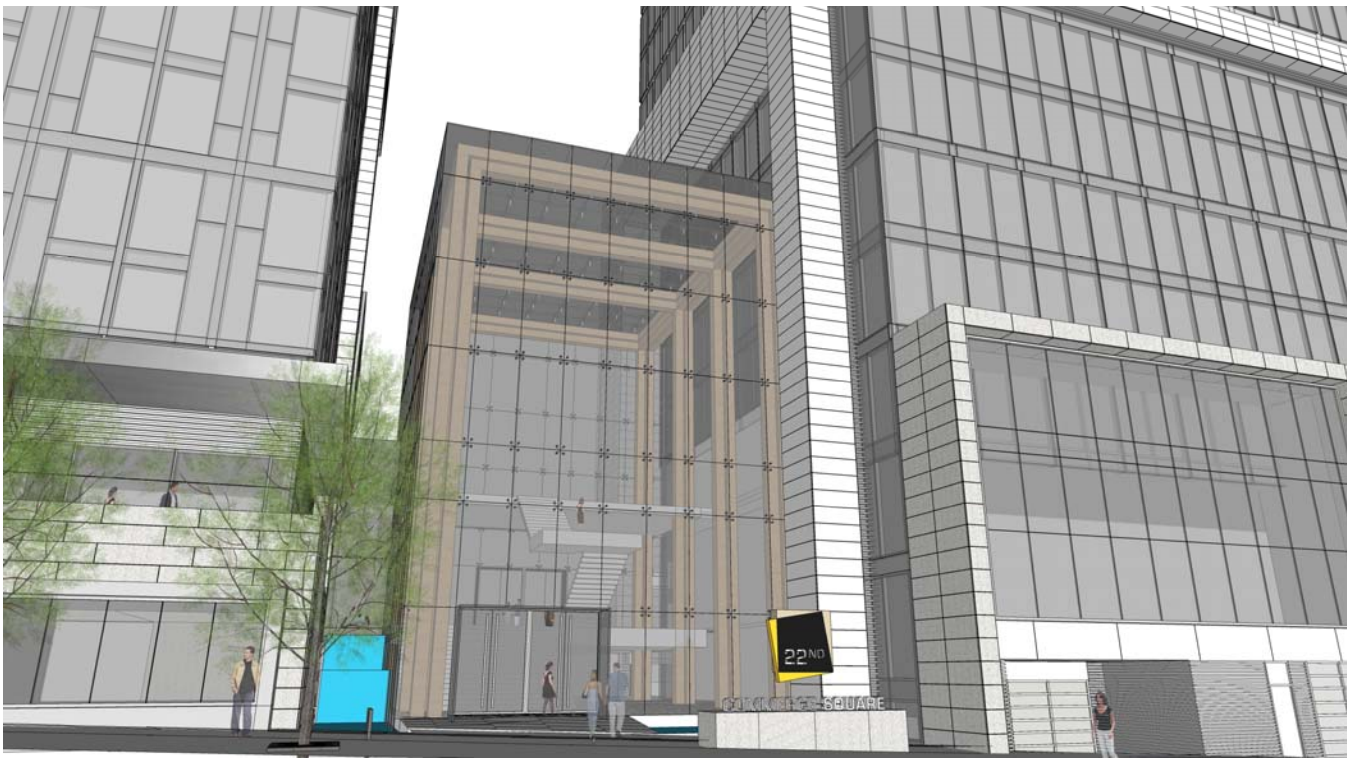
(Revised) Hollis Street facade of the atrium and east plaza.
